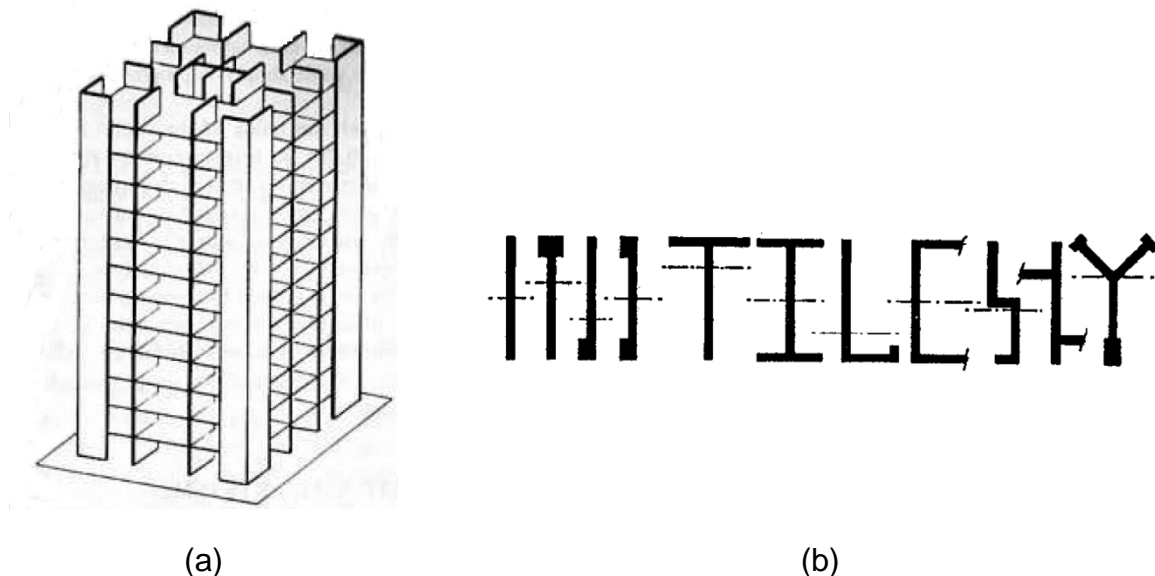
(a) Shear wall structure [40], (b) common shear wall sections [26]
